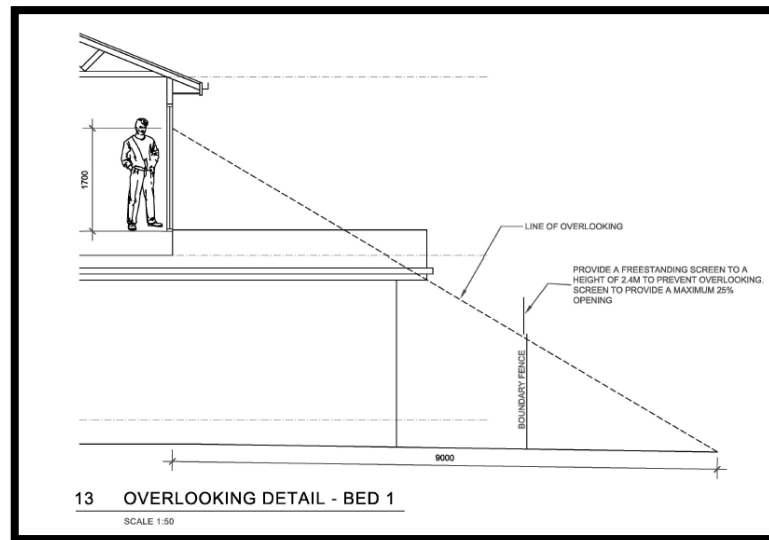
section plan demonstrating overlooking detail.<sup>6</sup>
